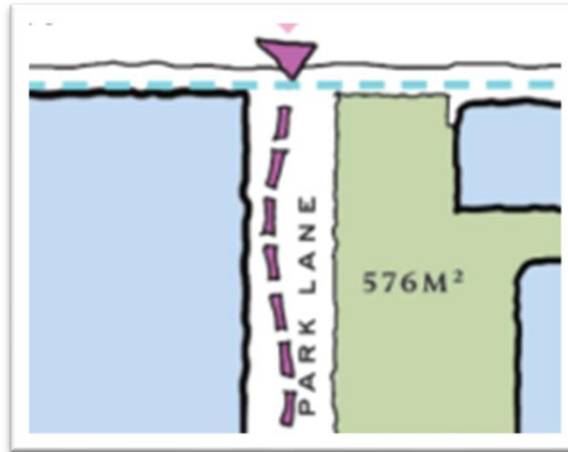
Building B layout in DP Source: Development Plan (Gurner 2023)
